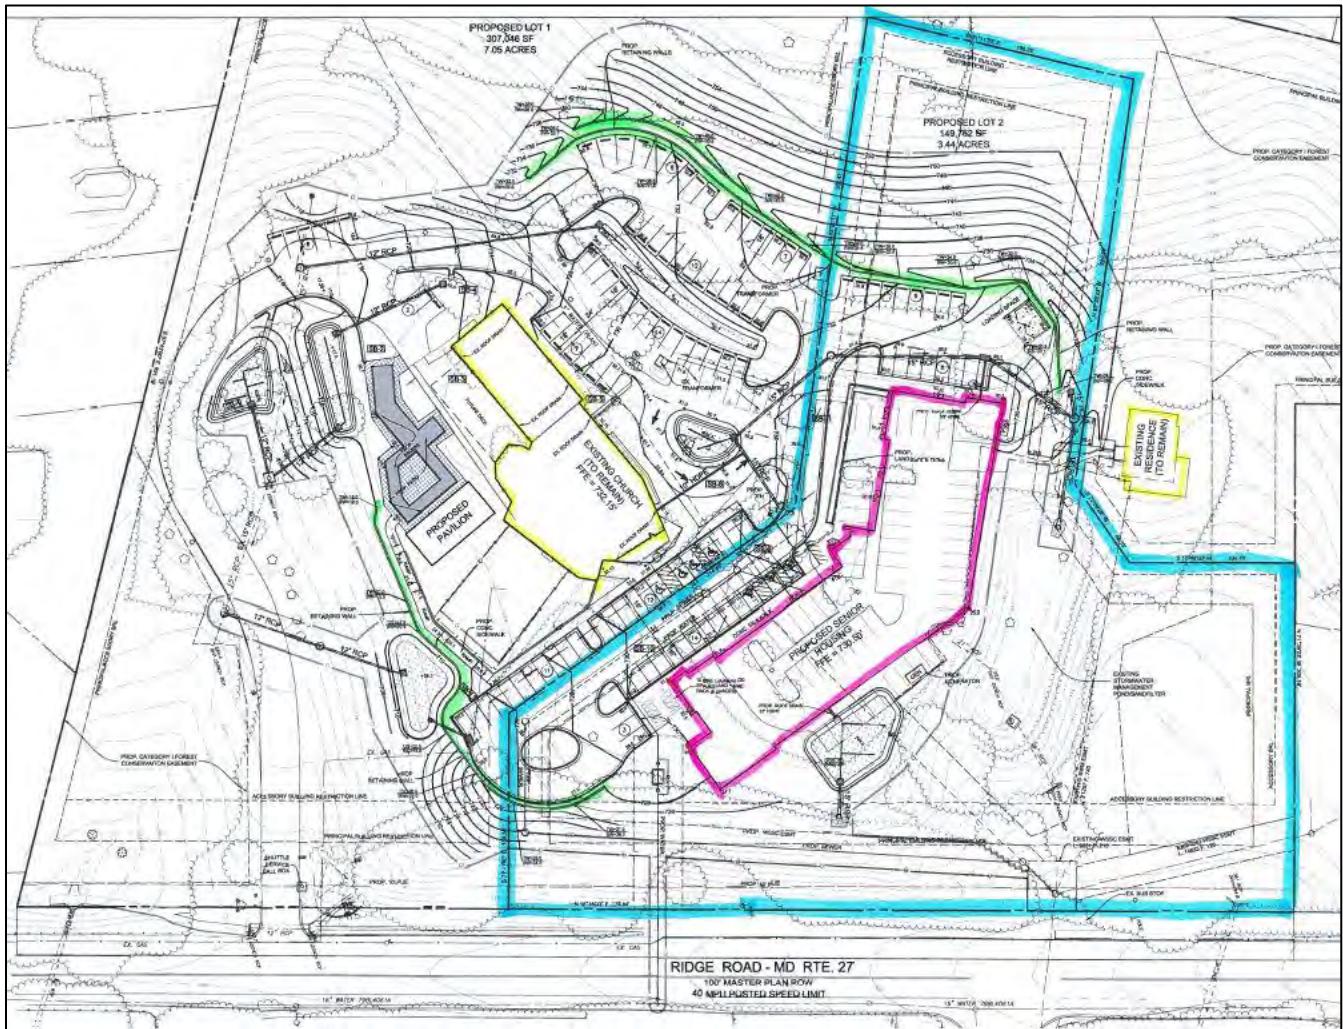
Existing church and house (yellow), with proposed building (pink), retaining walls (green), and new lot #2 lines (blue).
